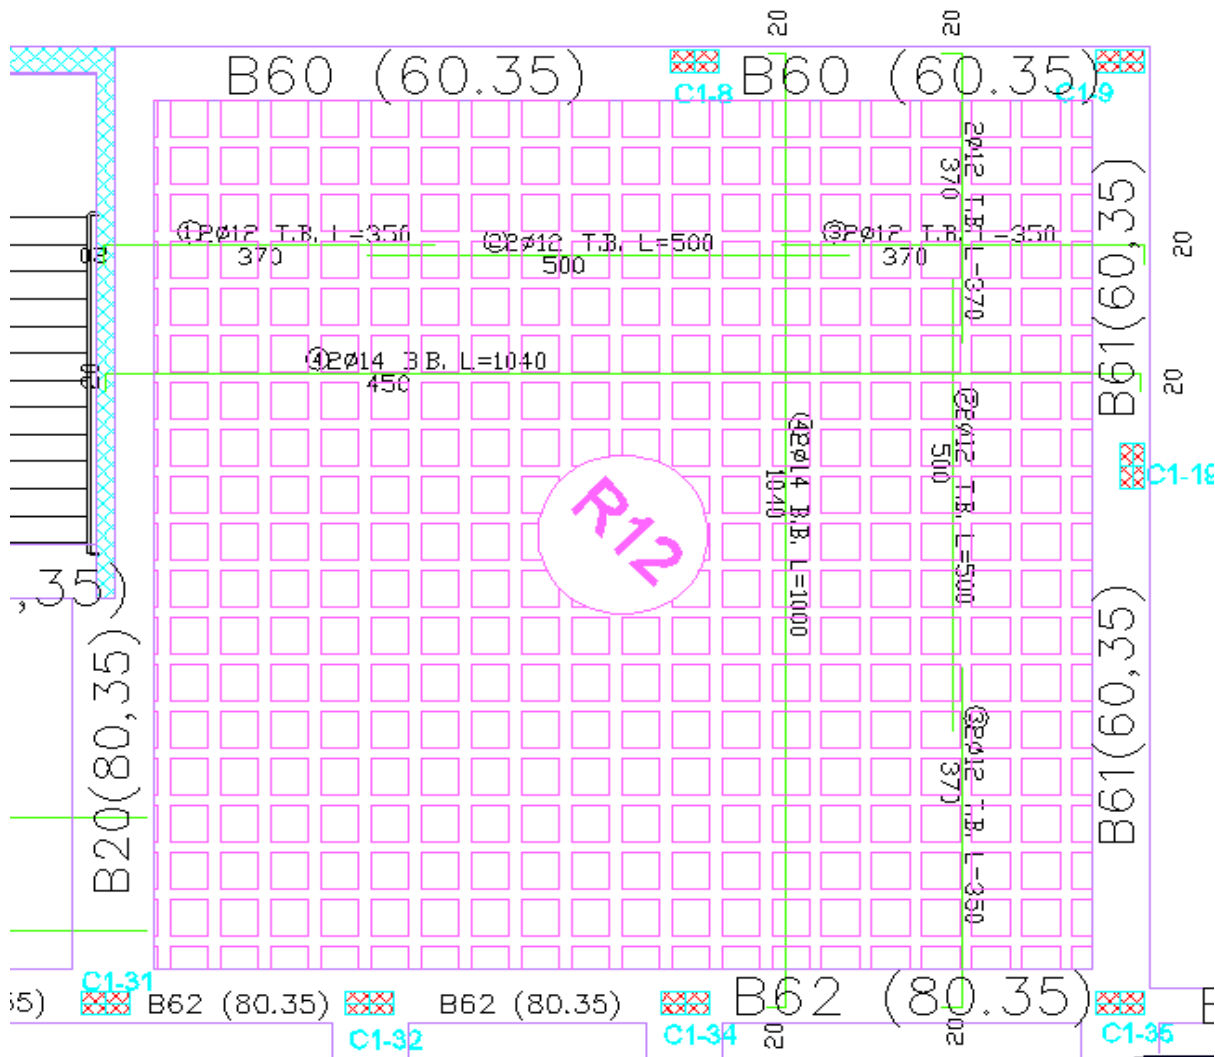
Flexural Design of Two Way Rib Slab (R12).
